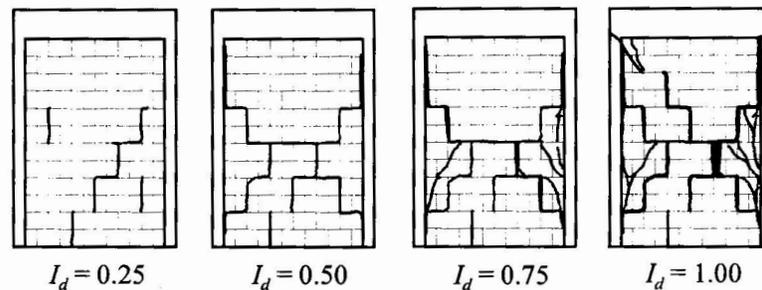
Definition of damage indexes I_d in the case of confined masonry walls
